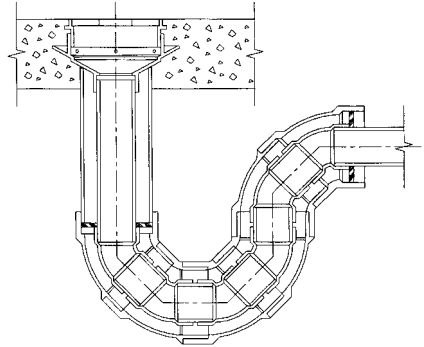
Example of a thermoplastic double containment floor drain with factory pre-assembled P-trap outlet. (*Orion Fittings, Inc.*)
